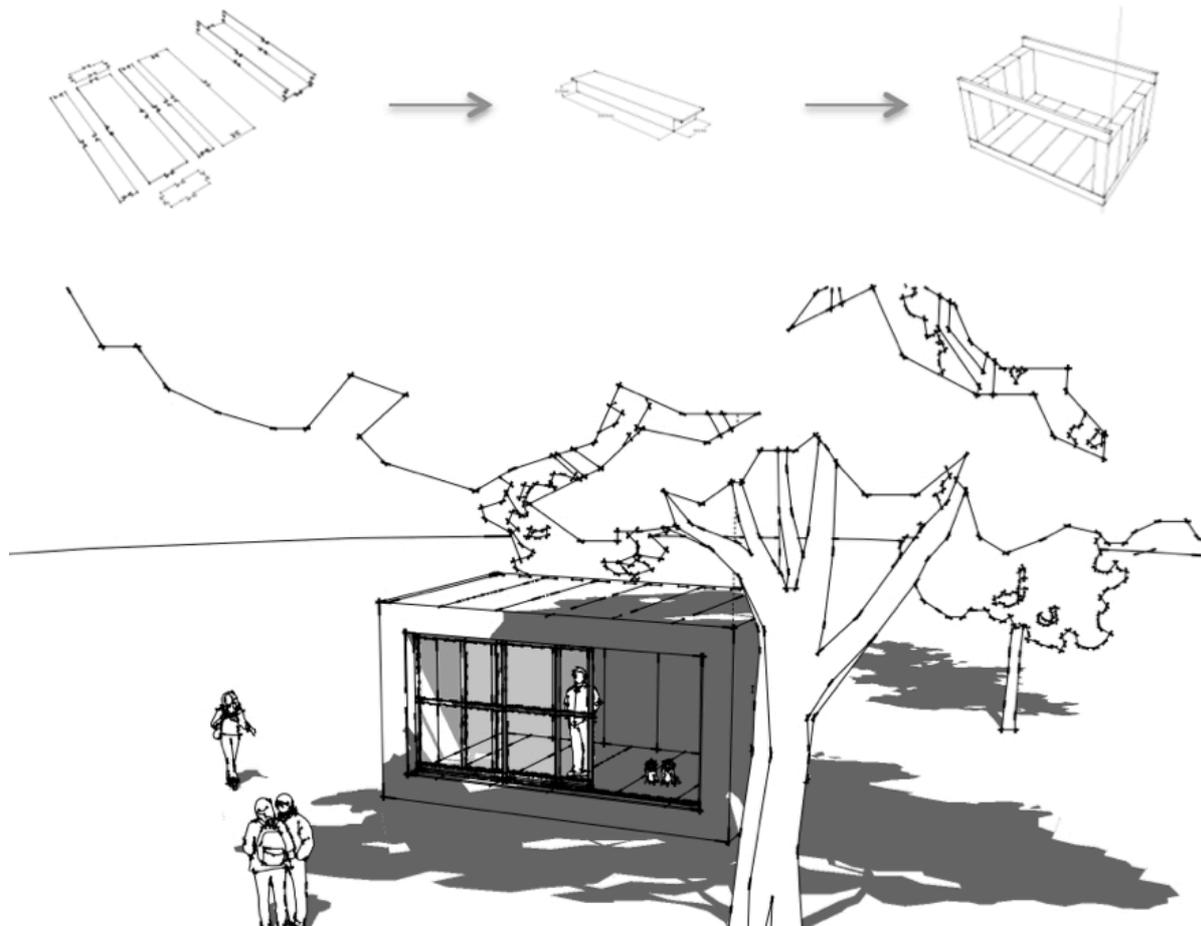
The EDFAB construction system to build a ‘sleep-out,’ a common addition to NZ domestic space
